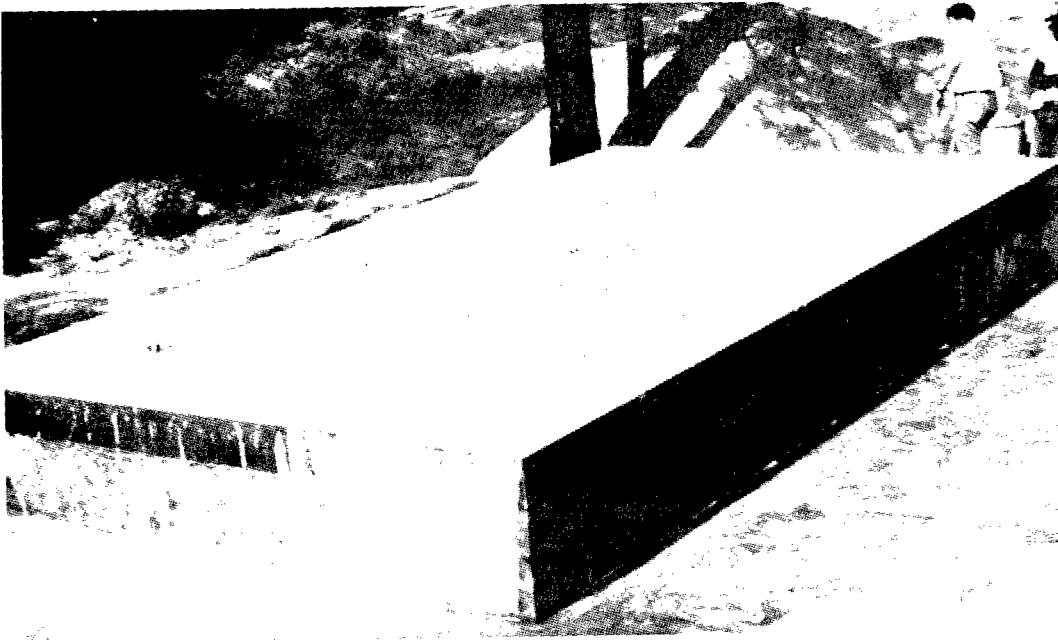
Bubbles from soapy water revealed cracks in roof after Test 1
